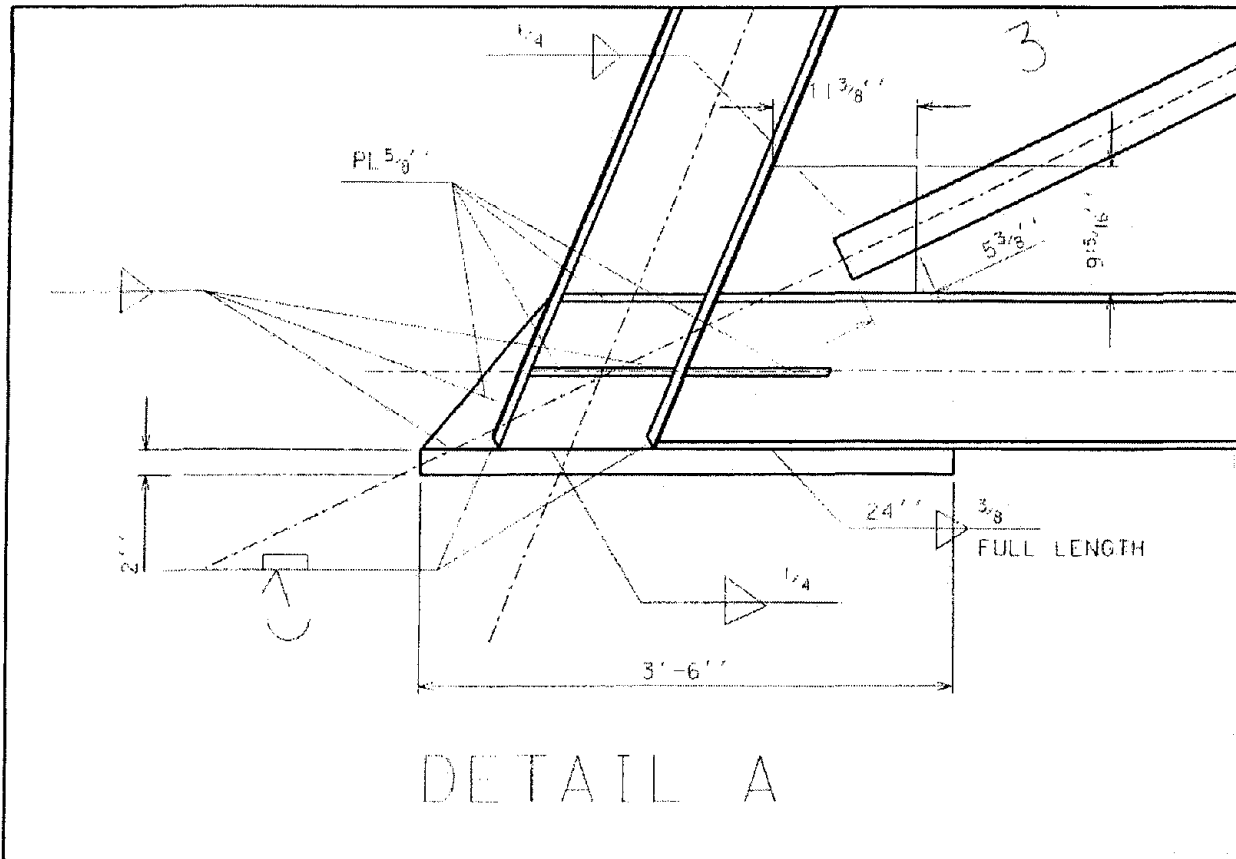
Construction drawing of load frame: Detail "A" (1'=305 mm, 1"=25.4 mm)
